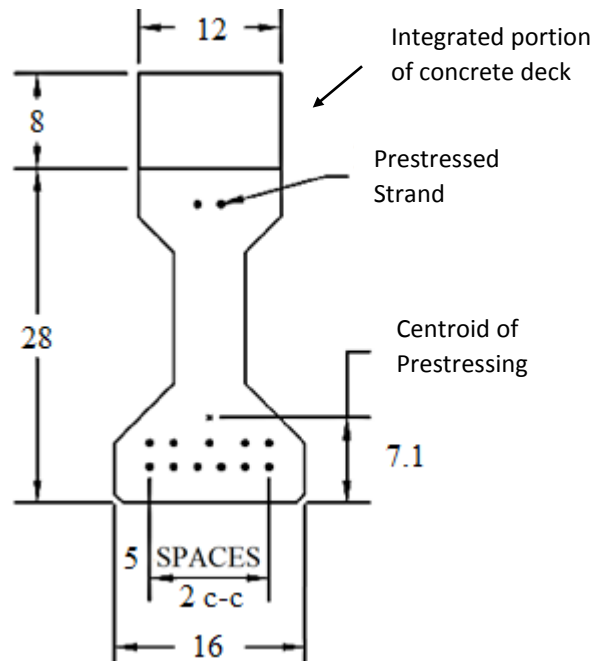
Girder Cross- Section and Strand Configuration (dimensions in inches)
